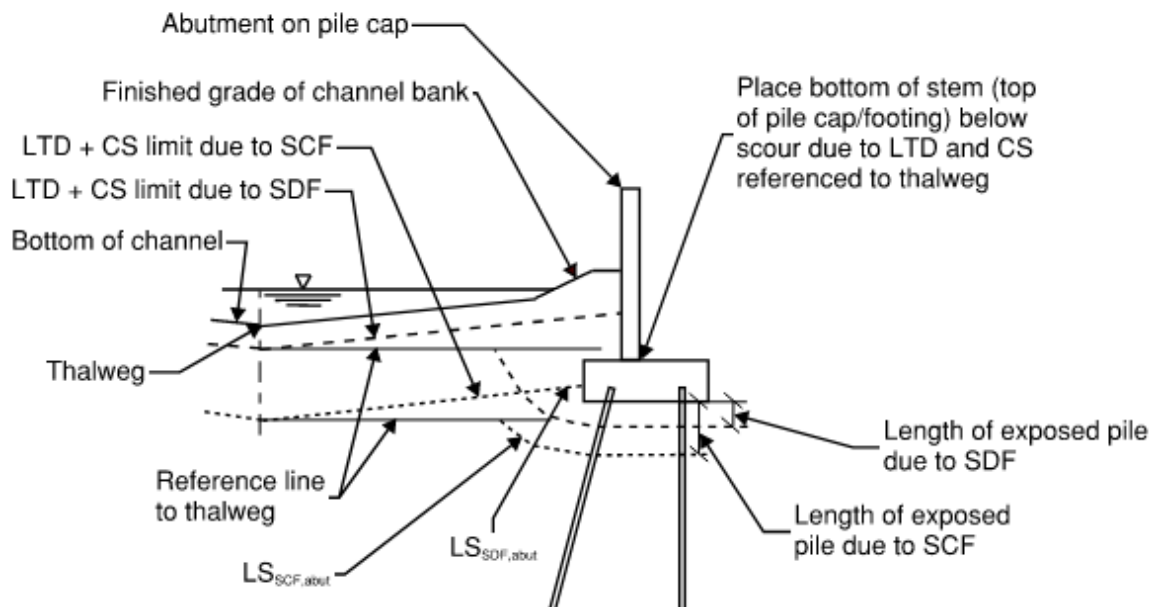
CT—Foundation Support and Placement for Scour With Lateral Migration
